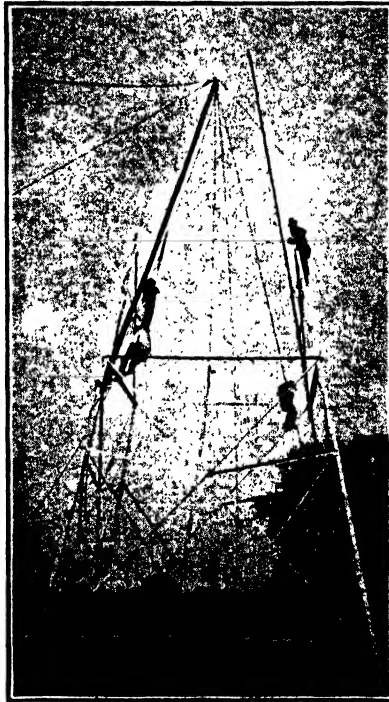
Method of erecting steel towers. (*Pacific Coast Steel Company.*)
